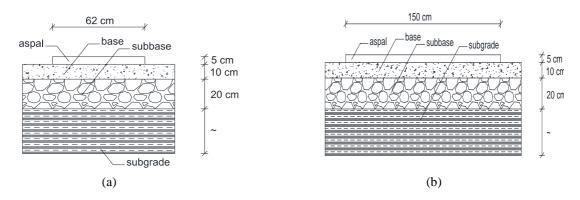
Dimension of pavement structure constructed at the test section. (a) cross section, (b) long section
